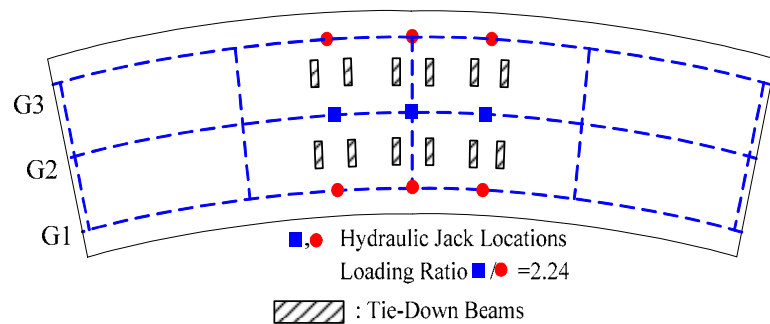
Test 4a loading scheme with transverse tie-down beams of Type 1 used for the first repeated loading test.
